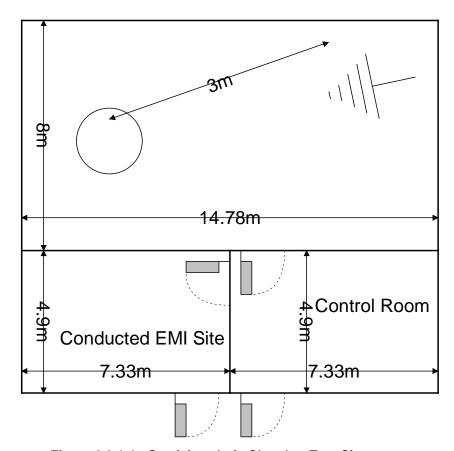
Semi-Anechoic Chamber Test Site
